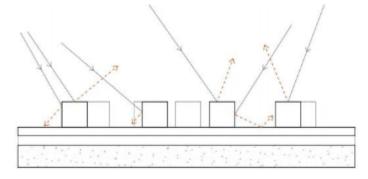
Sound diffusion details on wooden blocks (Lim, 2019)
